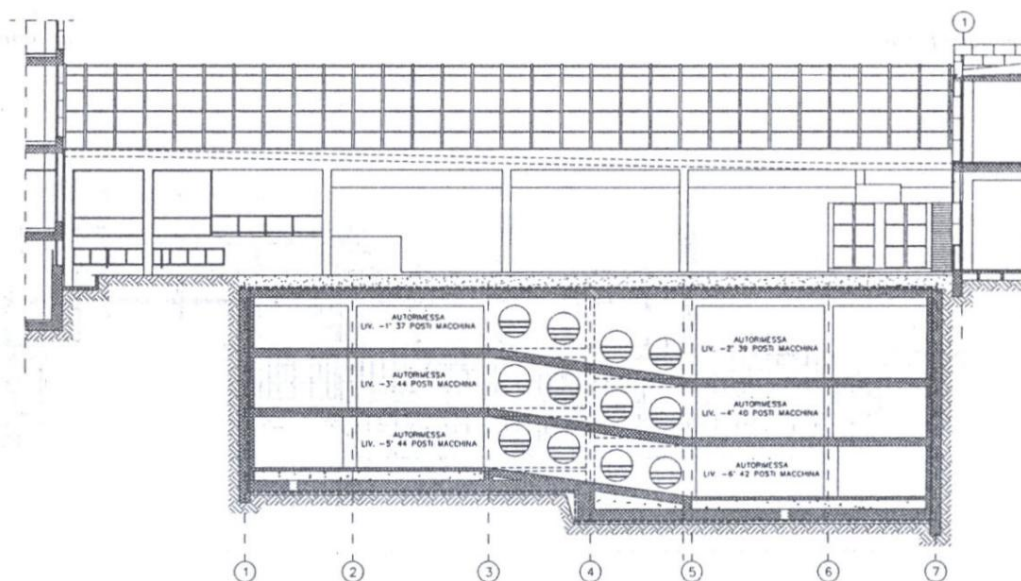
Underground garage project Banca Popolare di Milano service. Cross-section of the six underground levels connected by internal ramps to double meaning
